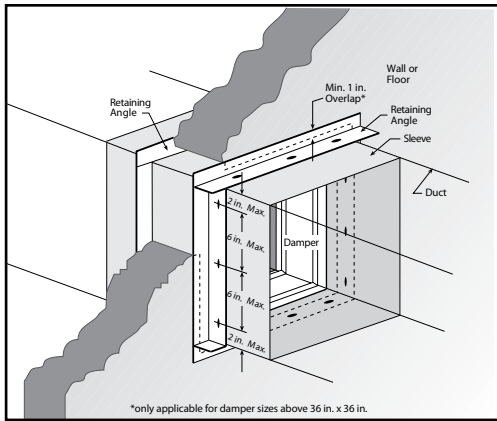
Both vertical and horizontal damper installations are typified by these drawings.
